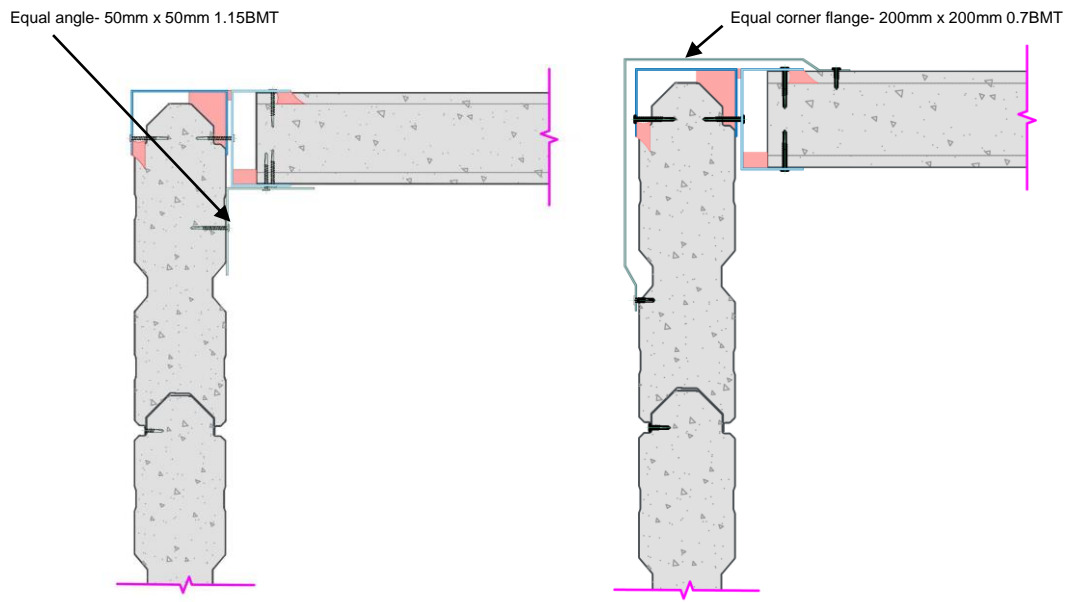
A- Corner connection details - Vertical to Horizontal panels.
